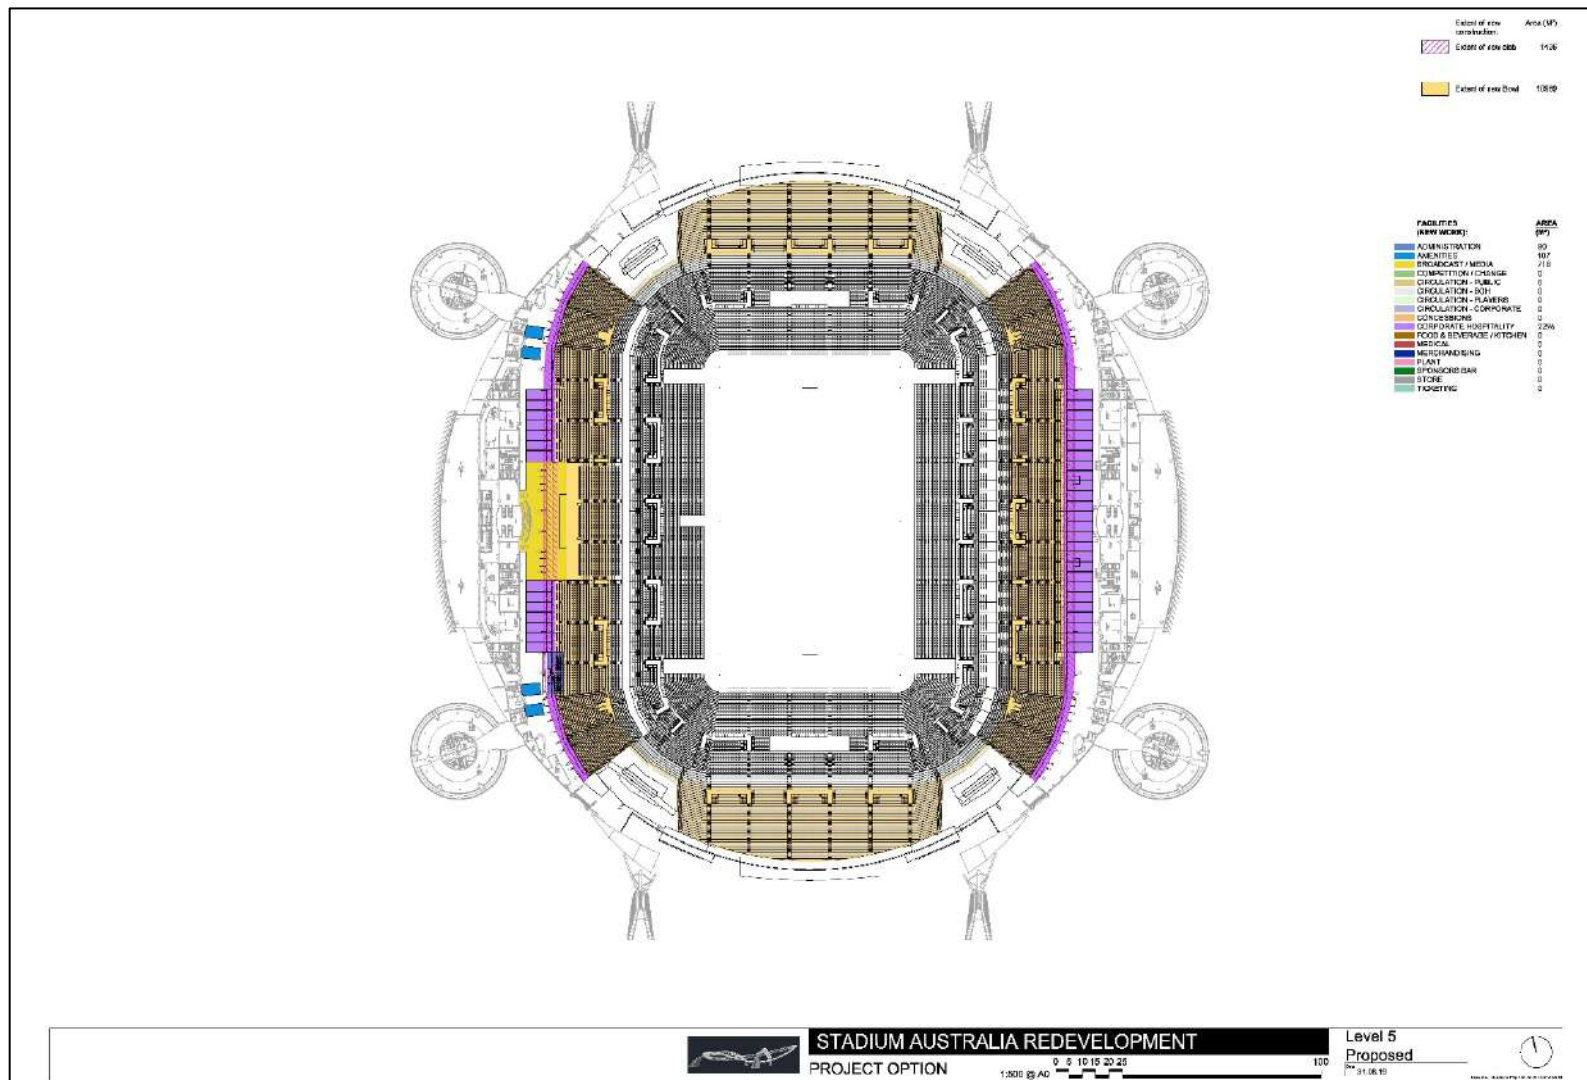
Proposed Level 5 Plan (Source: Cox, 2019)
